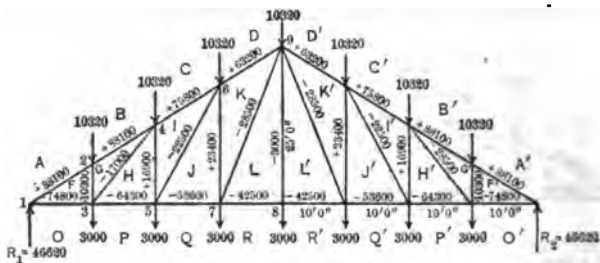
Pratt Truss. Inclined Ties. Truss-diagram
